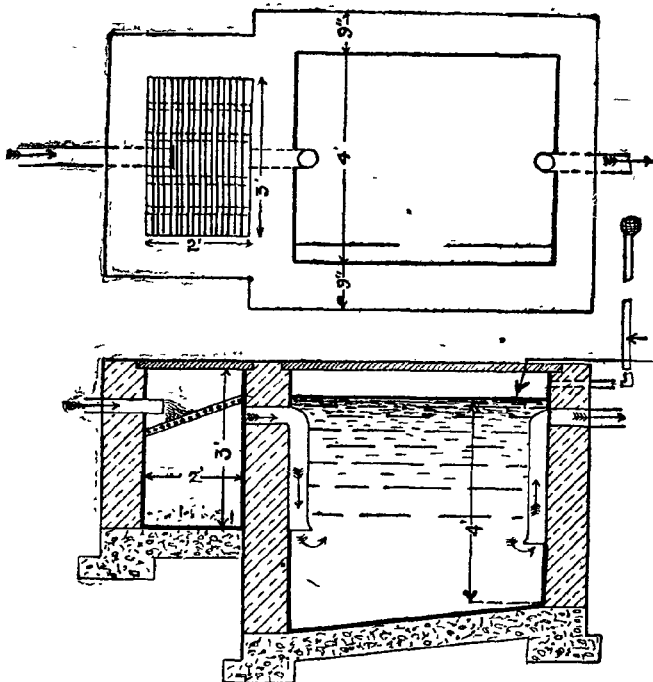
& 70. Section & Plan of Design No. 3 of Septic Tank.
